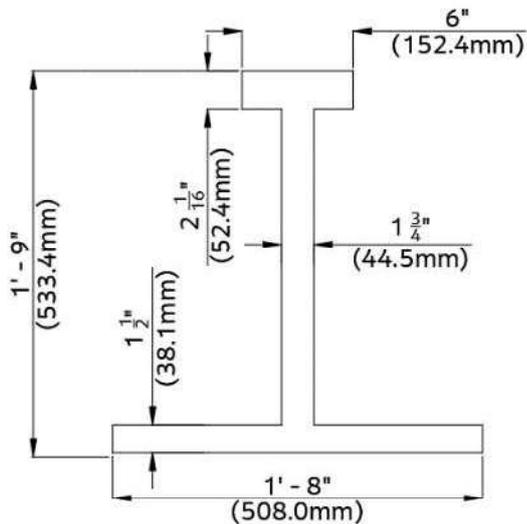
Girders 2 to 19 and 36 to 39 cross section (midspan)
